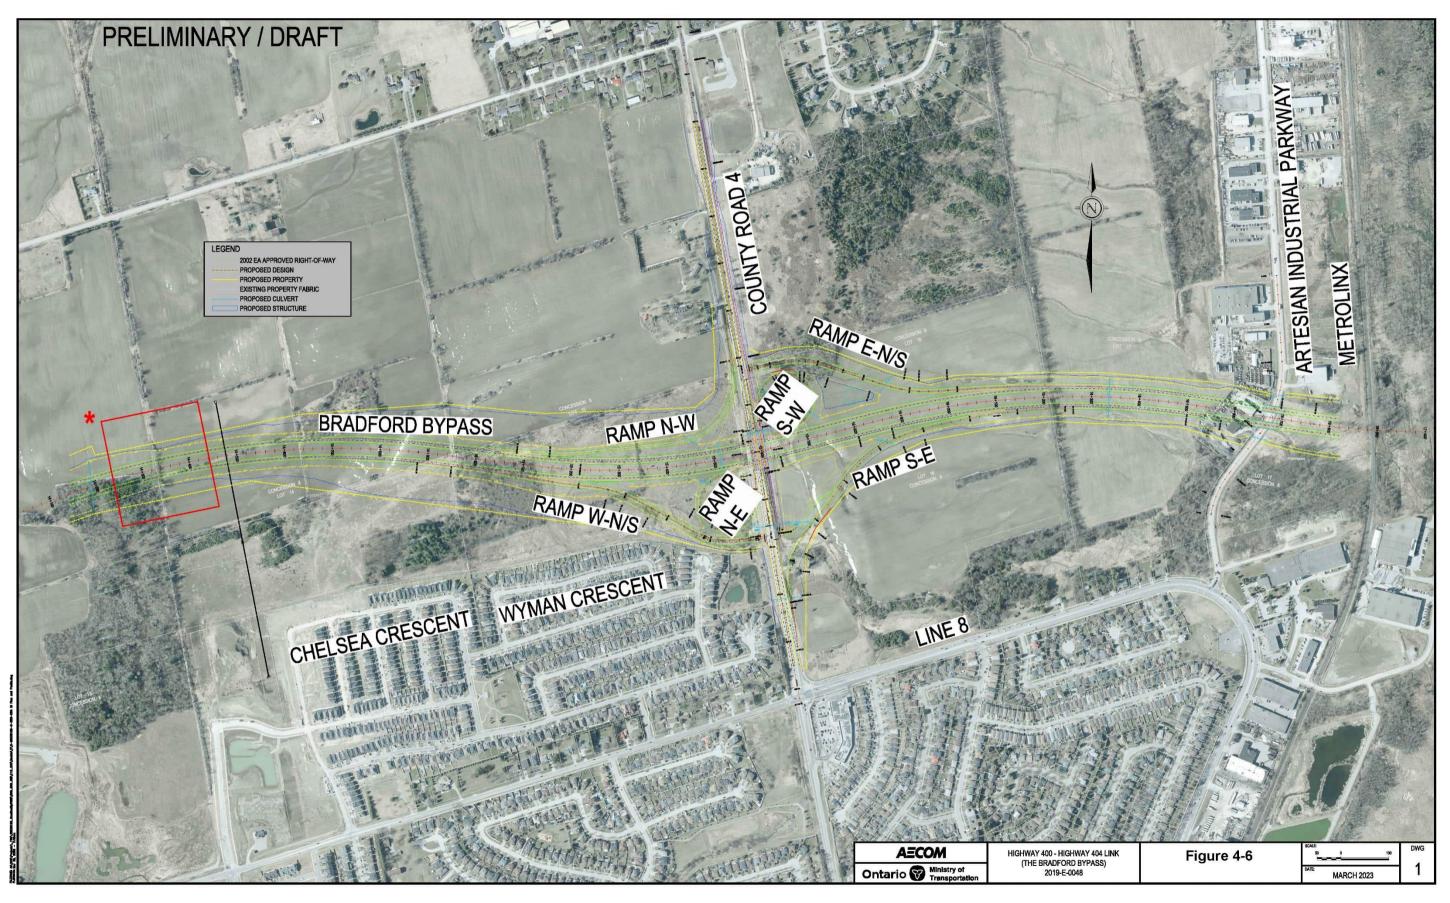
Recommended Plan for the County Road 4/Yonge Street Interchange
